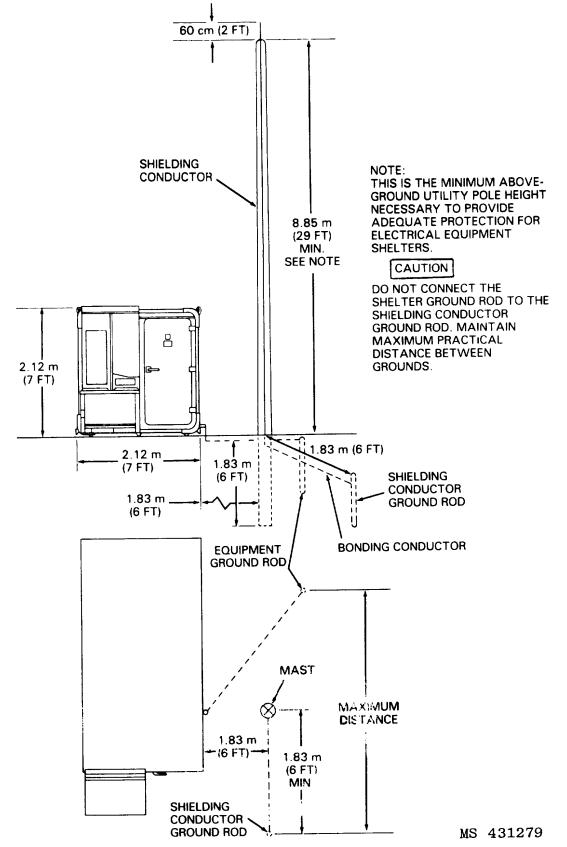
Typical lightning protection layout for electrical equipment shelters.
